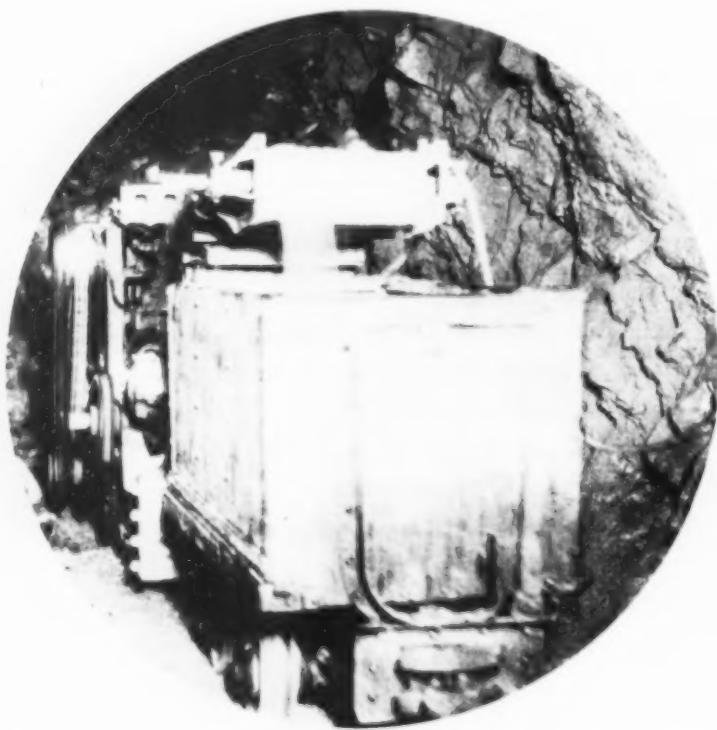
REAR VIEW shows Conway Mucker loading car. Car is coupled to mucking machine and travels with mucker as it moves back and forth to crowd and load.
